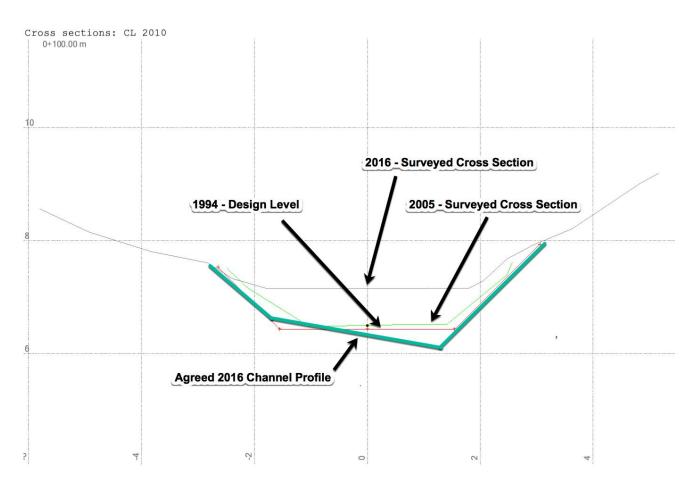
Wharemauku Design Cross Section (Chainage 100 m)
